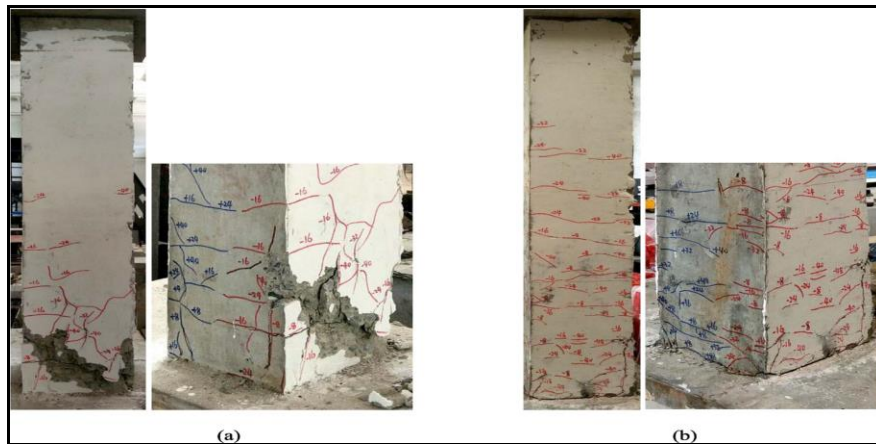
The Failure Modes and Crack Patterns of (a) Hybrid-Reinforced Concrete Column, (b) Hybrid-Reinforced ECC–Concrete Composite Column
